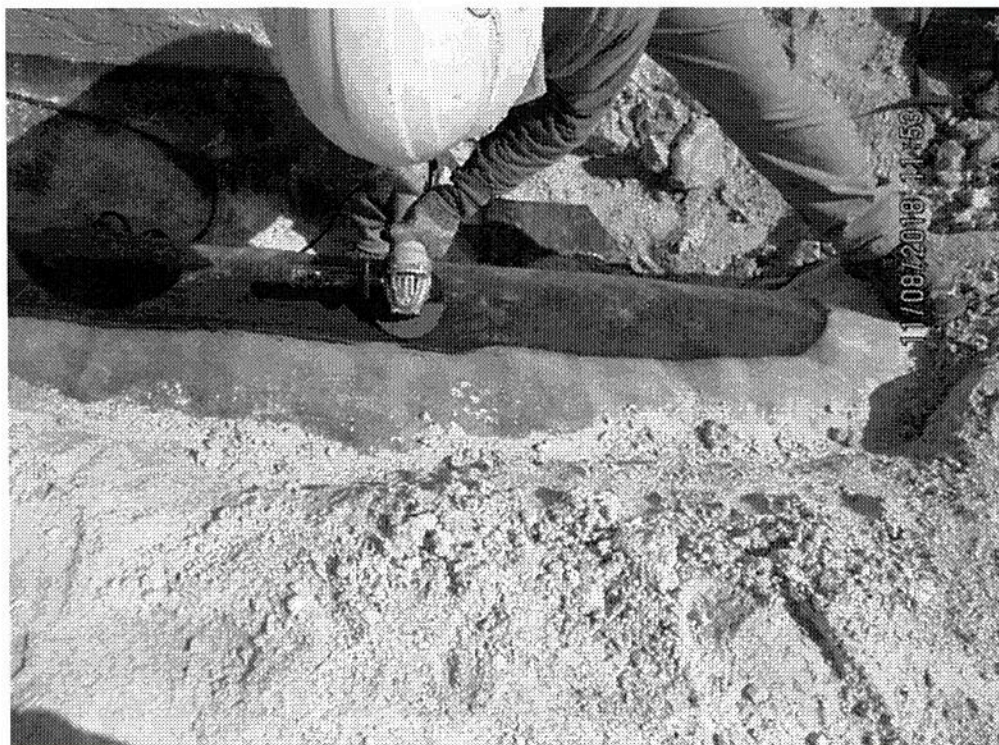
Workers shaping and cutting new liner patch material to repair damaged liner panel along anchor trench
